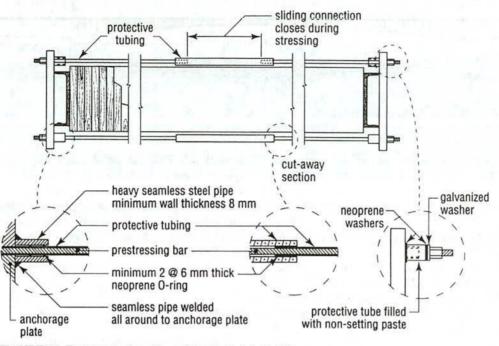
Post-tensioning of wood-laminated deck (30).
